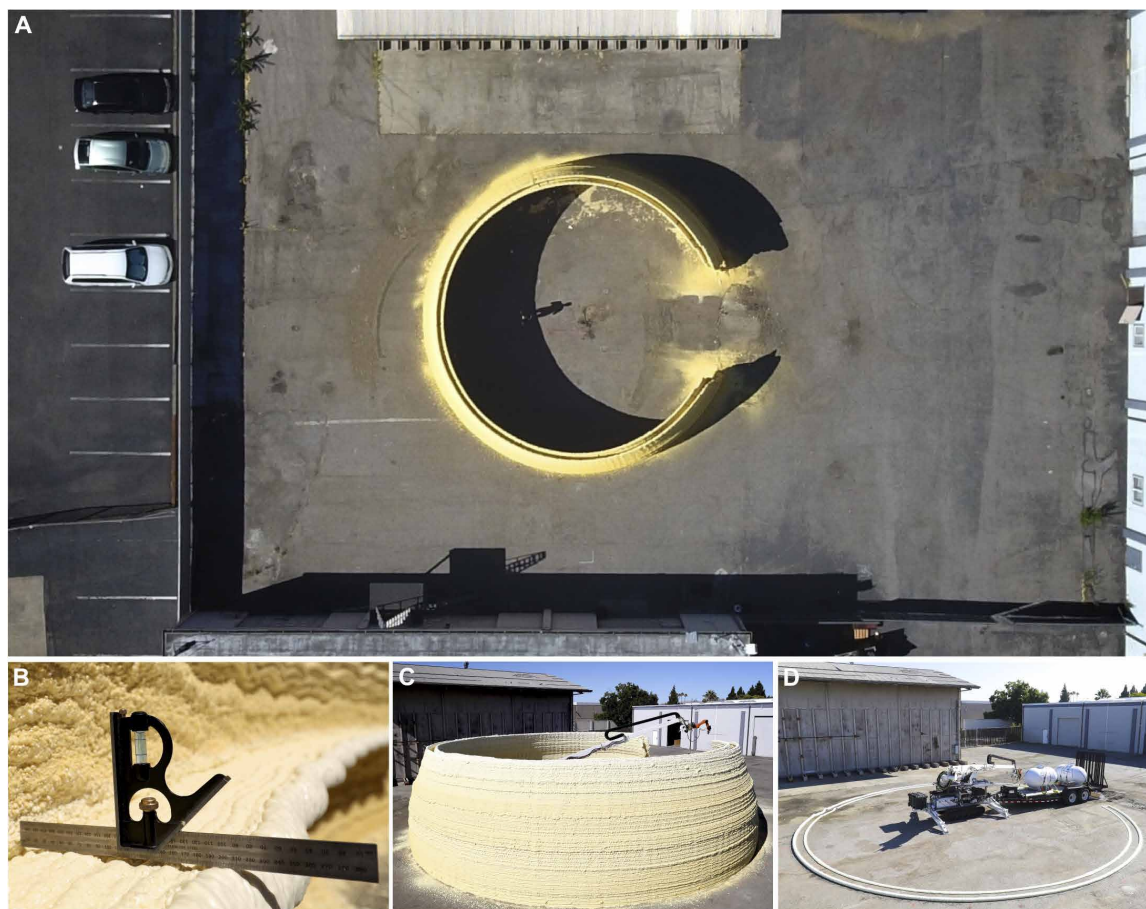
Architectural-scale hemi-ellipsoidal dome section case study. (A) Open dome, top view. (B) View of horizontal bench structure, fabricated as an overhang feature without support material on the inside of dome wall. (C) Completed structure, side view. (D) Beginning of 3D print, showing DCP with trailer.
